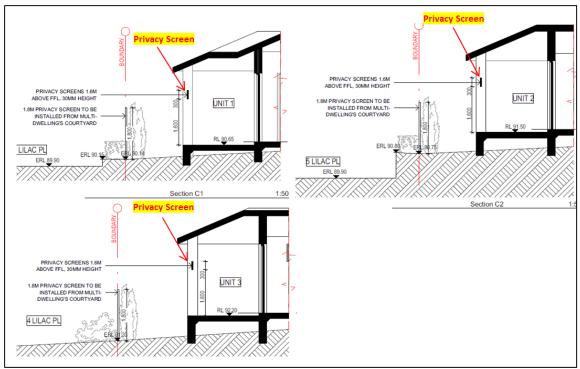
Sections (Note: Privacy screens are subject to a minimum width of 500mm as per amended Condition 33).
